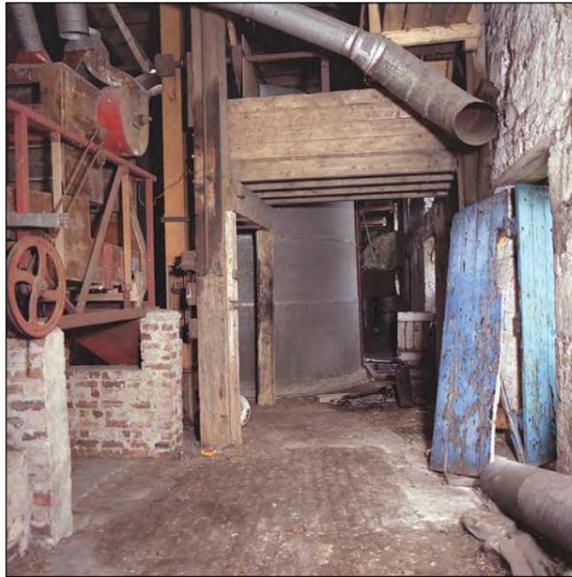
Range A, Interior detail of the grain silos machinery, looking west.
